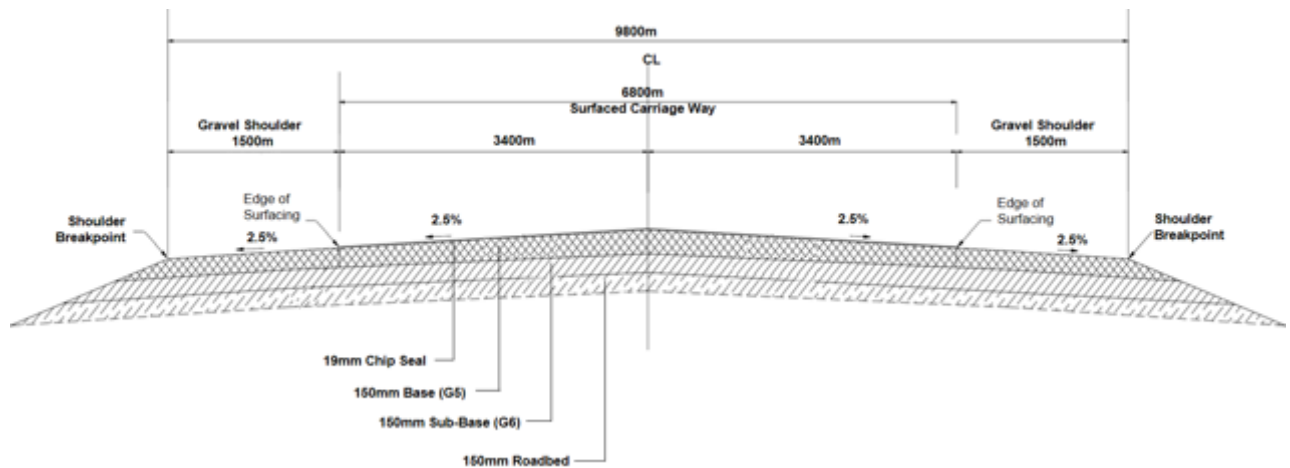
Typical Cross Section (Source: Dream Engineering, 2025)
